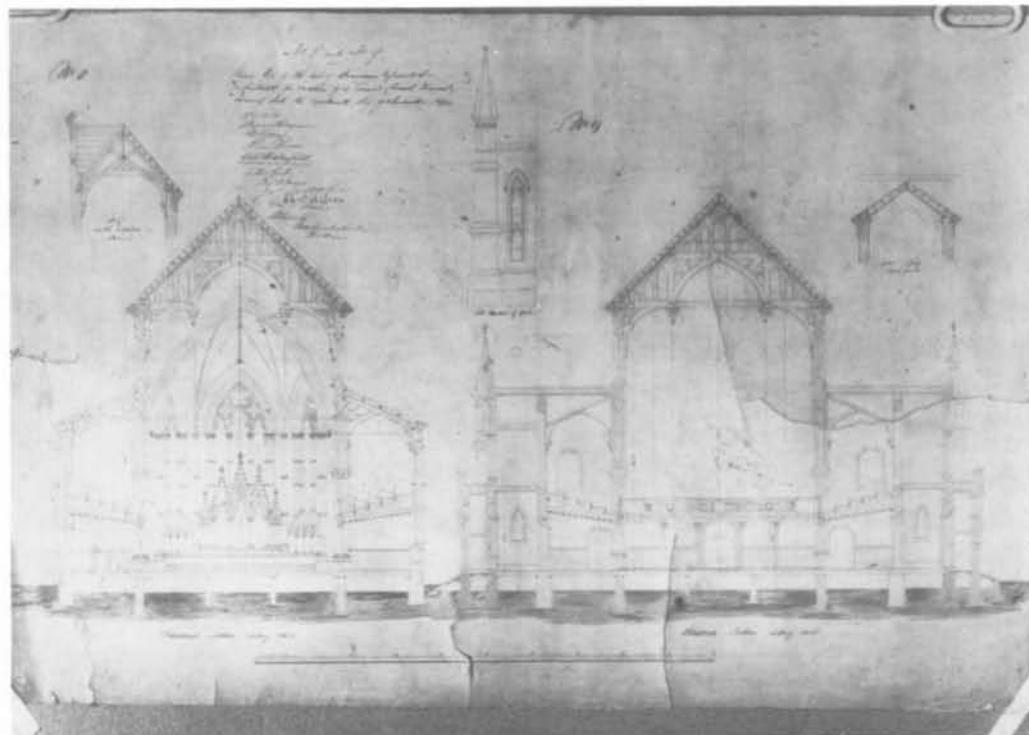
F. W. Cumberland, St. James' Cathedral (Ang.), Toronto, largely 1850-53, transverse sections looking north (left) and south (right); contract drawing, 1850. (Photo: Archives of St. James' Cathedral).
